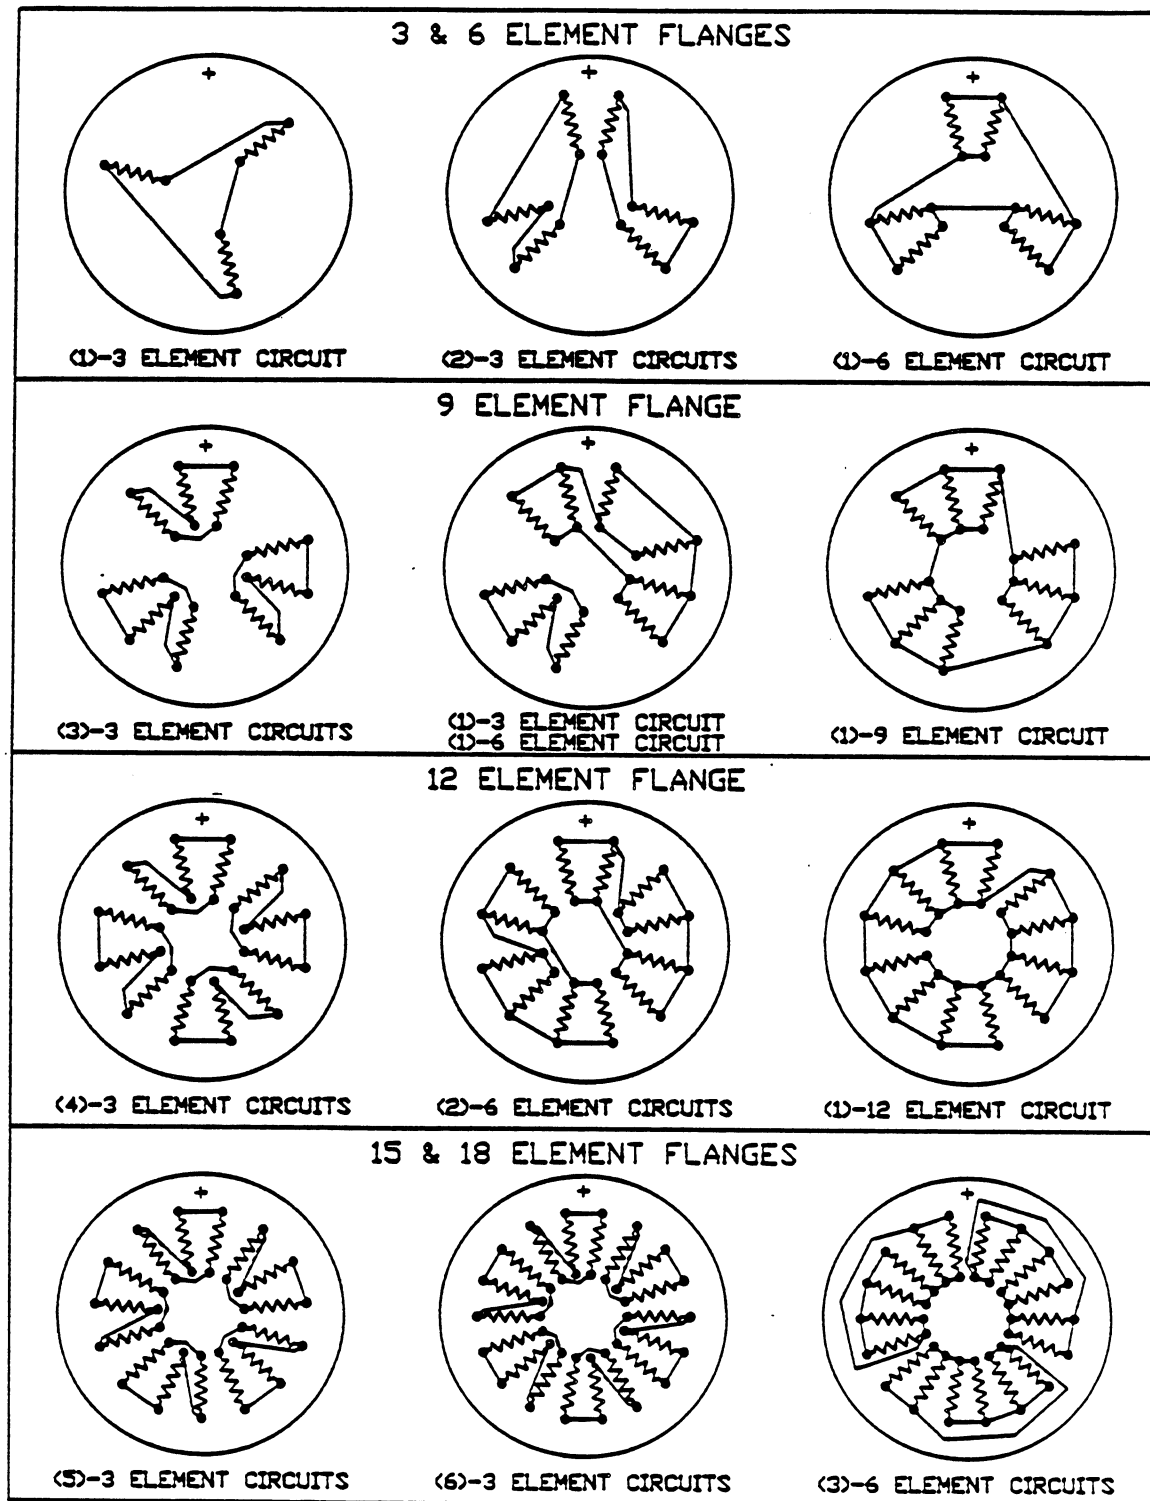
/BOILER ELEMENT BUSSING DETAILS
